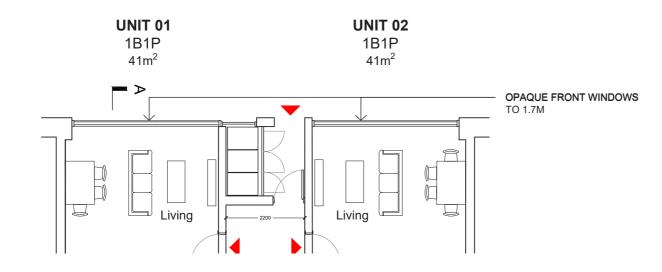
Approved partial ground floor plan ref. 23/1819/FUL
